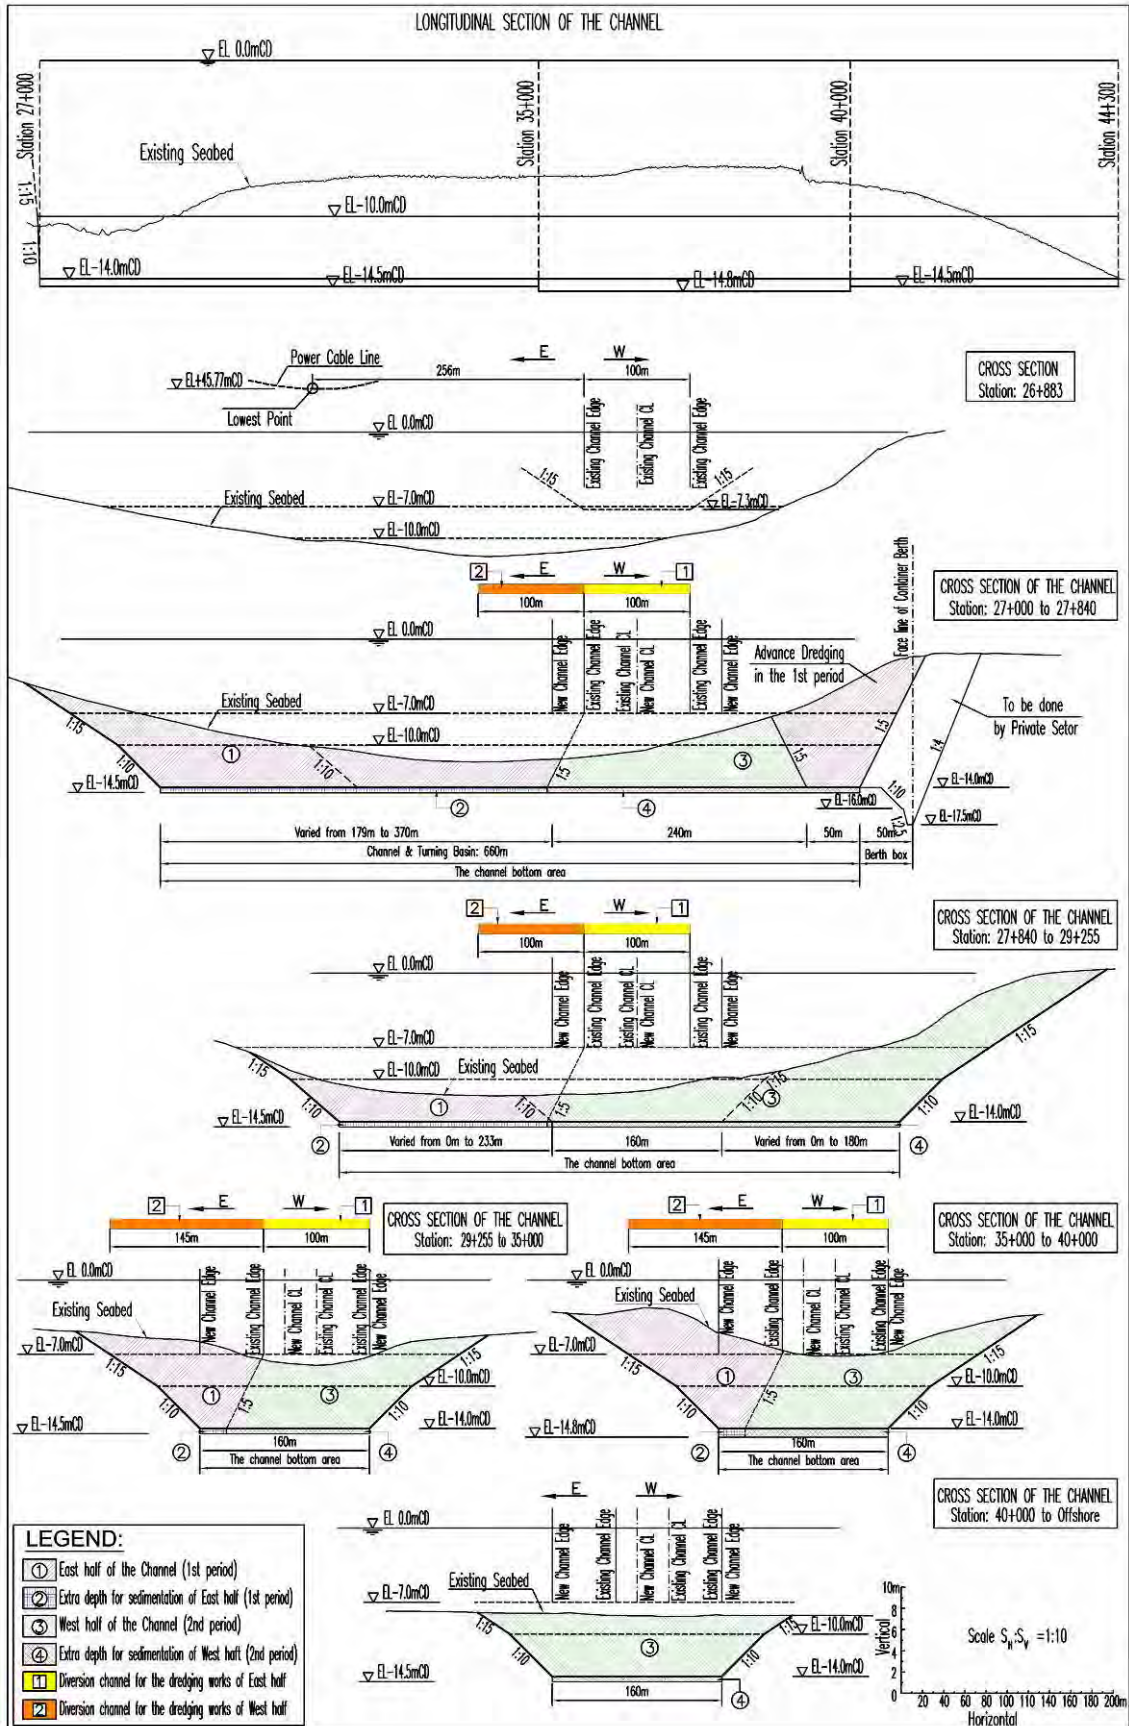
Longitudinal and Typical Cross Section of the Channel and Turning Basin
